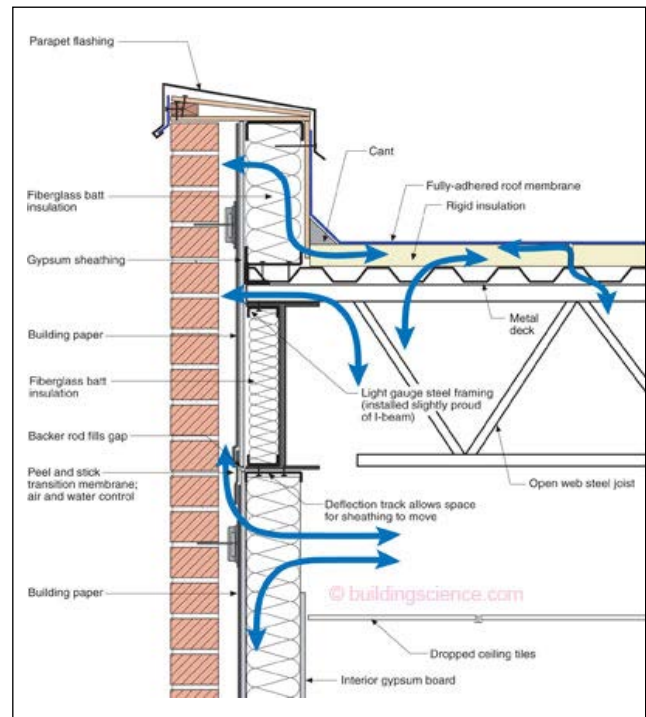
Problem Parapet – Air leakage into and out of everything and everywhere. No membrane under the parapet flashing. No air control in either the roof assembly or the wall assembly. No vapor control layer and thermal bridging everywhere. (Insight Parapets: Where Roofs Meet Walls, June 2011)
